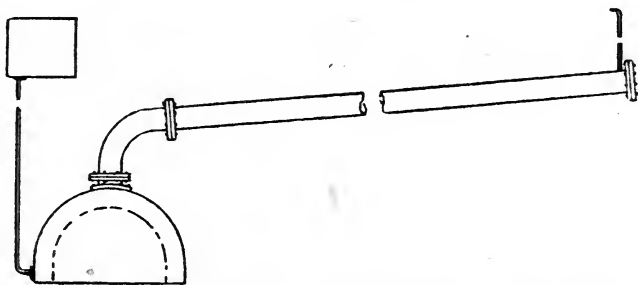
The oldest form of hot water heating apparatus with single "circulating" pipe.
